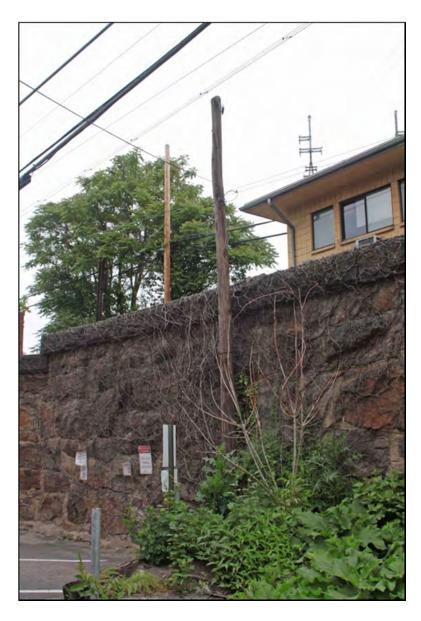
Retaining wall south of Marshall Street, camera facing northeast.
